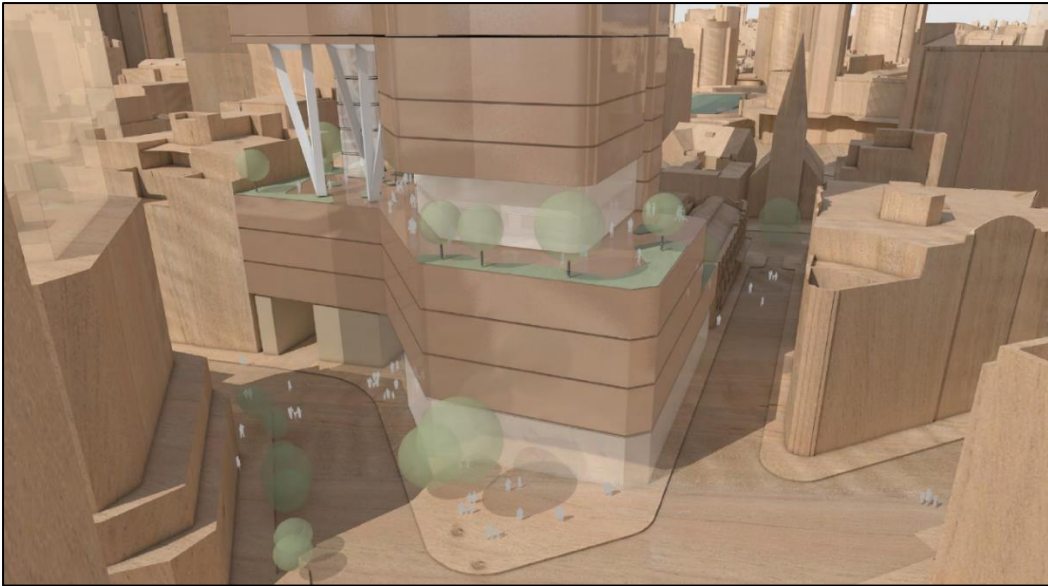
Proposed Building Envelope (Source: Proponent's Urban Design Report)
